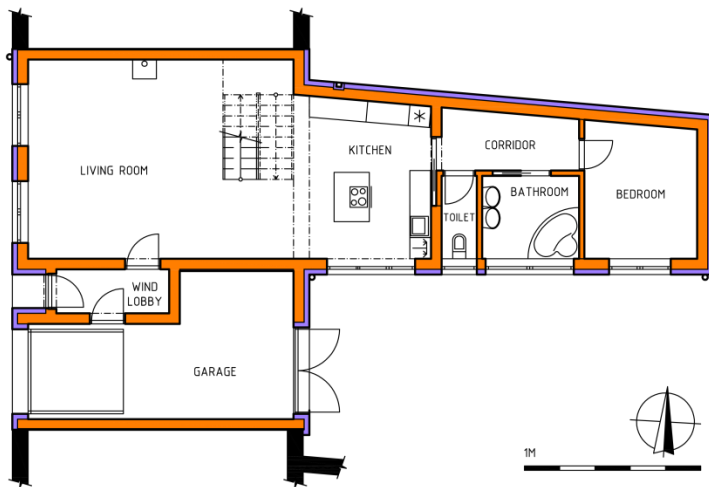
Ground floor plan of the new Přebice 442 single-family house. Colours indicate main construction materials: Black – neighbouring buildings; Orange – hollow ceramic blocks; Purple – ETICS.
